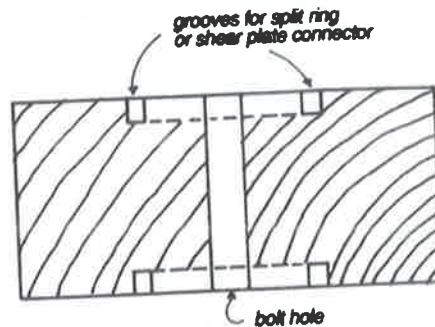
Net Cross Section at a Split Ring or Shear Plate Connection
